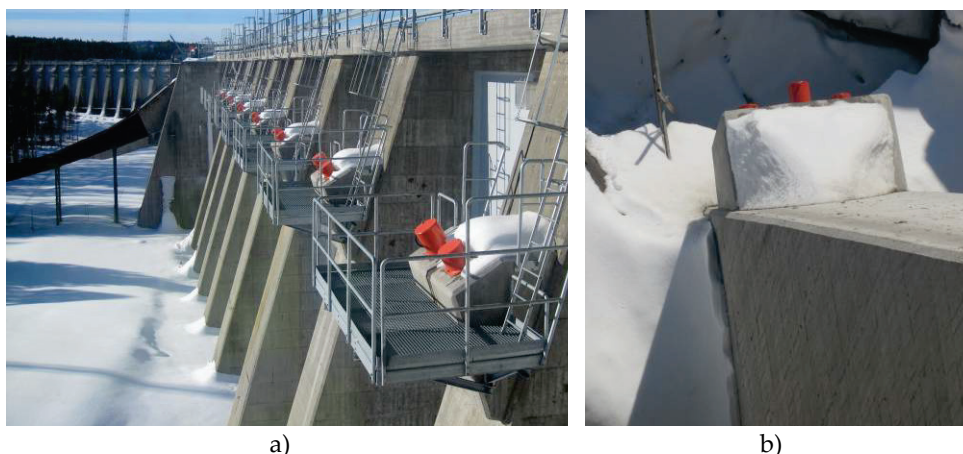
Photo of anchor blocks and arrangement of pre-stressed cables, a) rock anchored cables, b) horizontal cables at the dam toe
